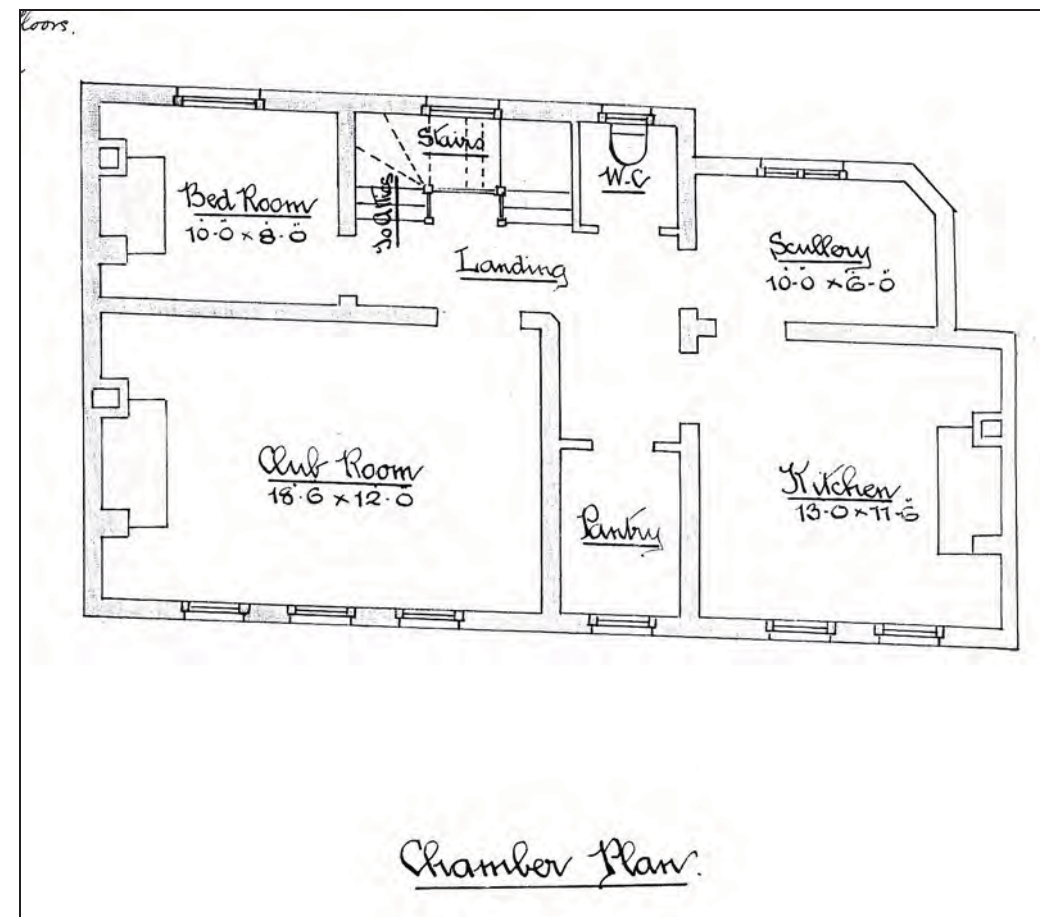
LBR Plan 3666 of 1896. No. 10 Northgate Street chamber plan, not shown to scale.
